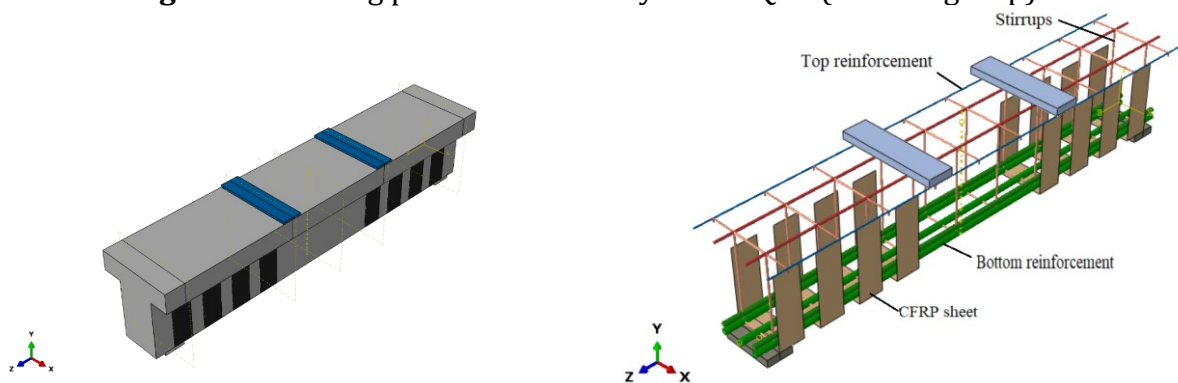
Creating parts and assembly in ABAQUS (shear group).
